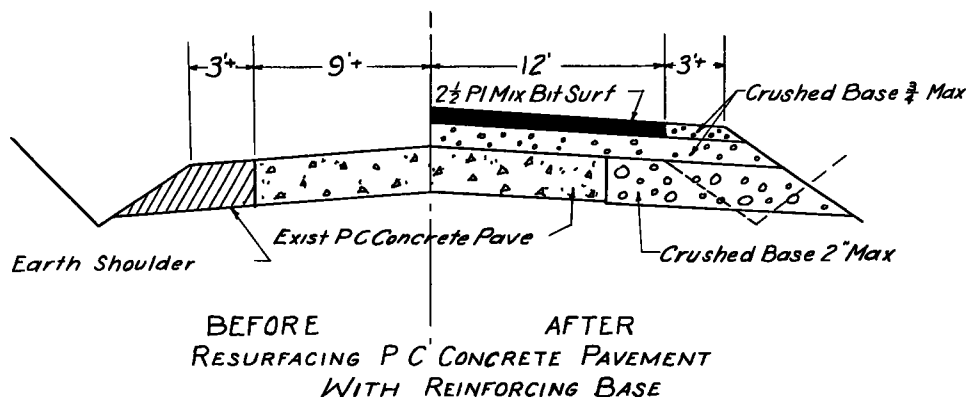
Widening and resurfacing portland-cement concrete pavement.
